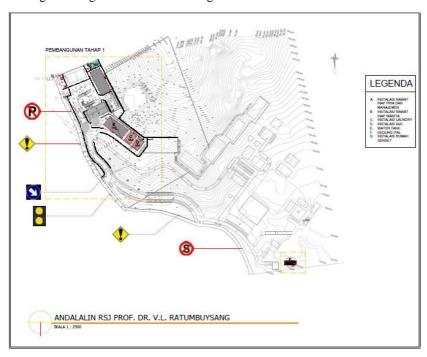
External Traffic Signs Kalasey Dua – Sea Road Section stage 1.
